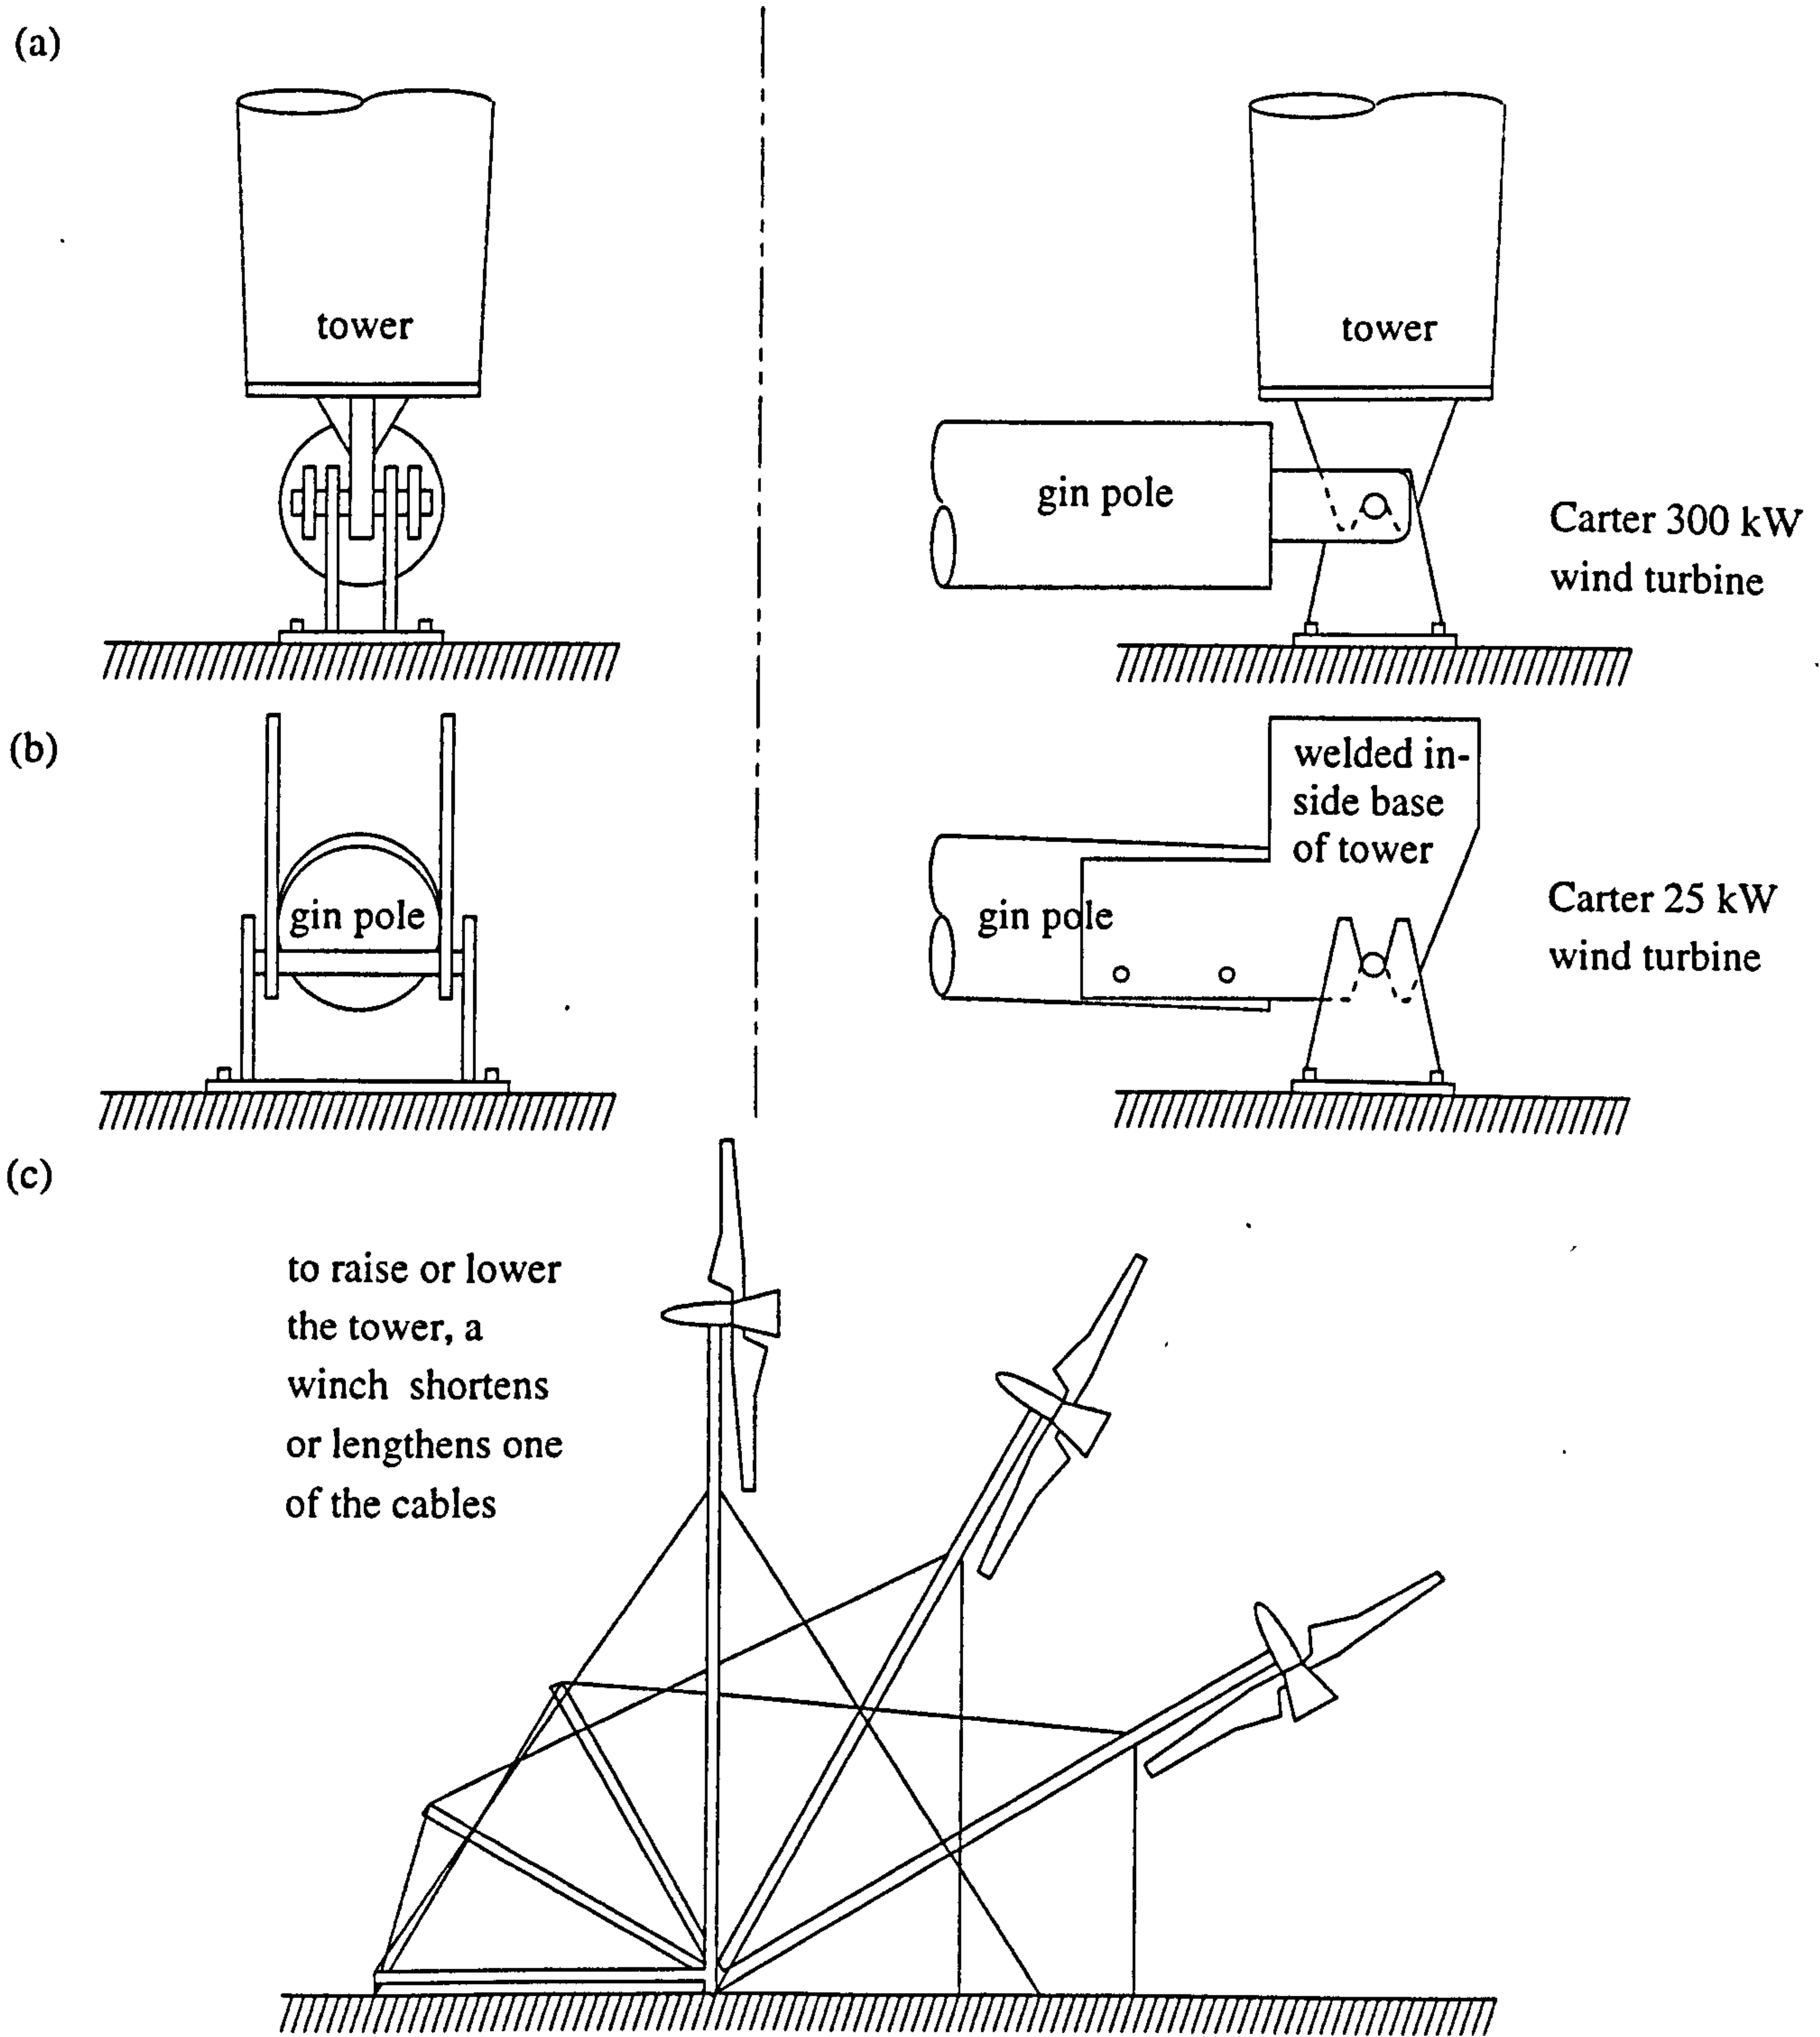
The layout of the base hinge showing where the gin pole joins the tower. (a) Carter 300 kW machine, (b) Carter 25 kW machine. (c) When the tower is raised or lowered, this pole carries the guy cable connected to the winch.
